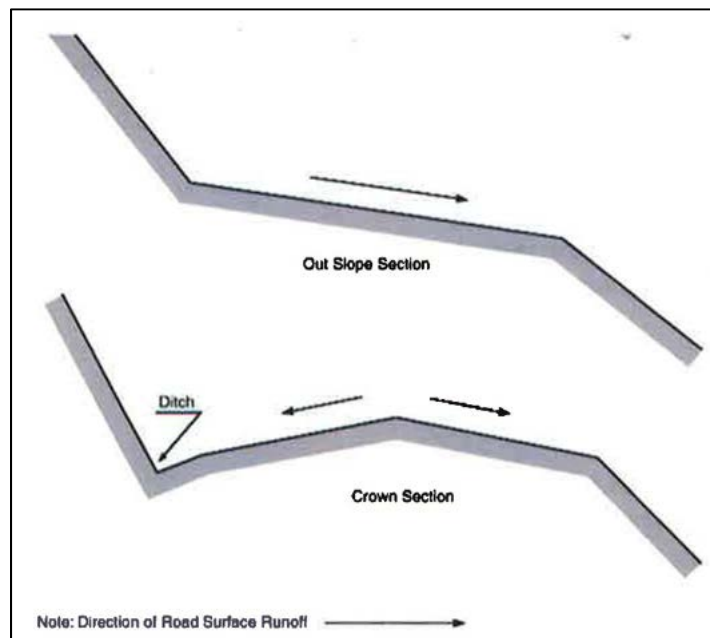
Outsloped and crowned road configurations (USFWS 2005)
